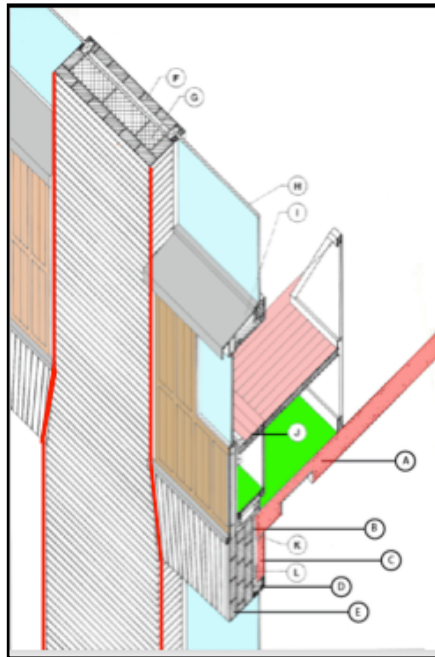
Detail of decreasing exterior column as it rise and Carrels (Ford, 1996, p.326)
